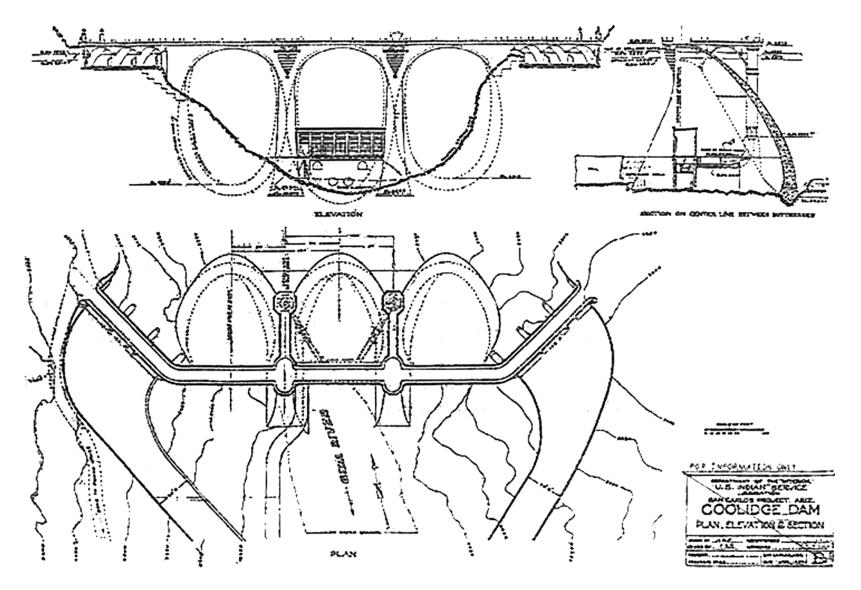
Figure Coolidge -2.—Plan, Elevation and Section View of Coolidge Dam (Courtesy of BIA archives).
